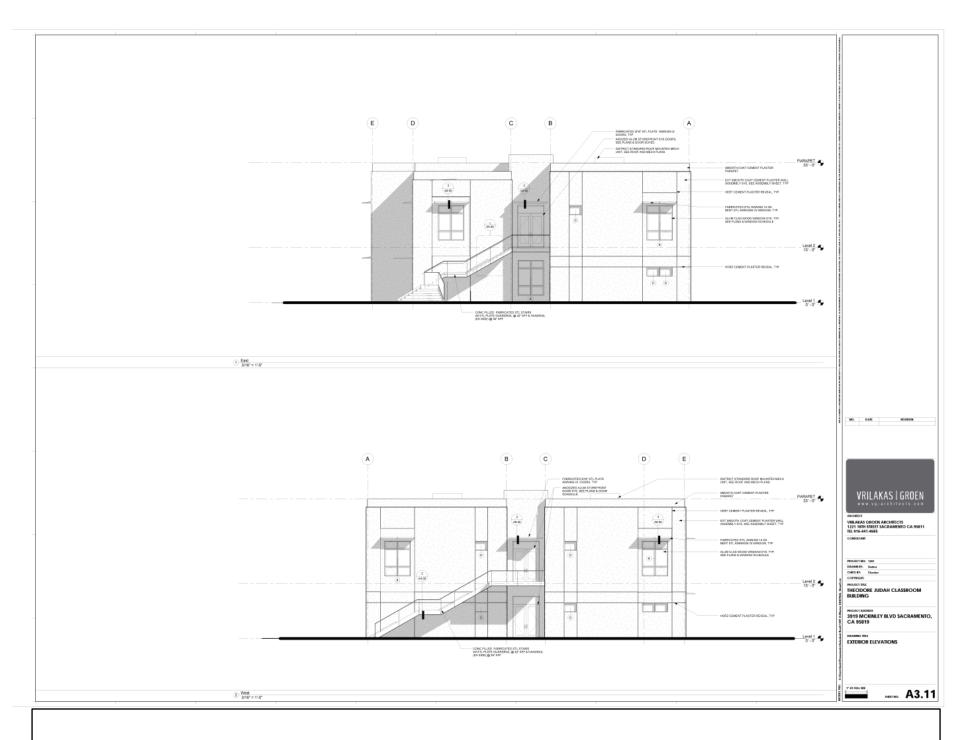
SIDE OF BUILDING ELEVATIONS
